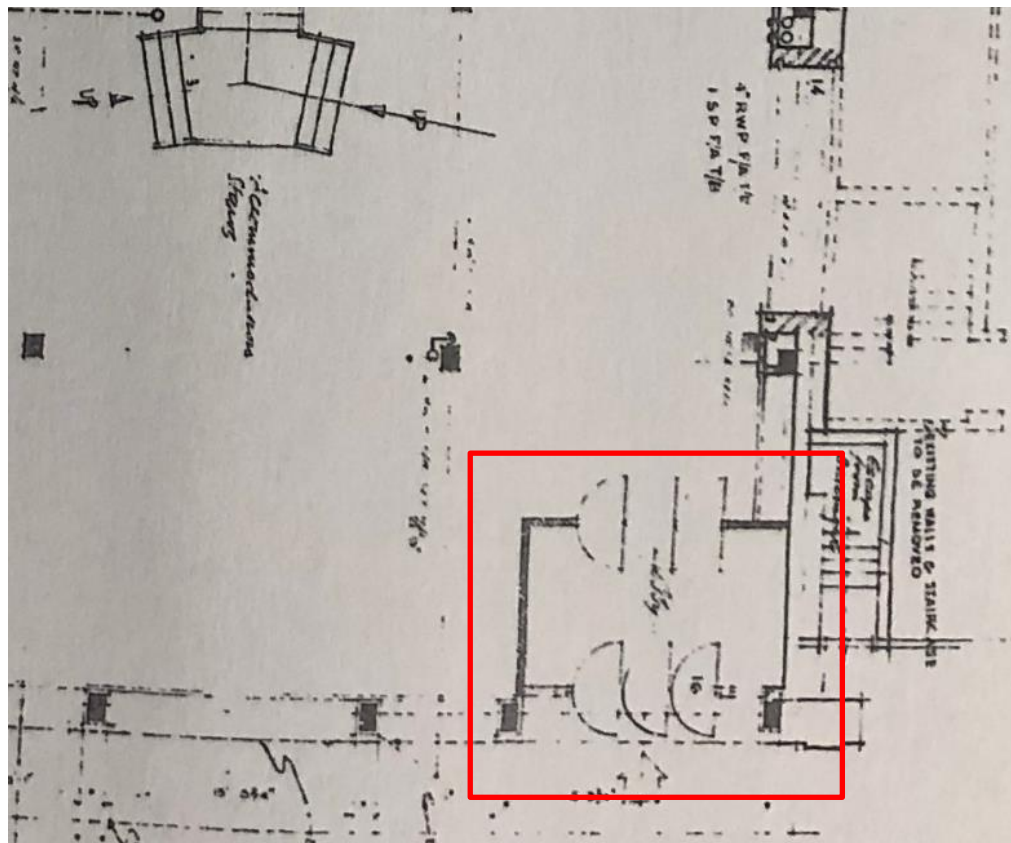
Extract of 1963 Proposed Ground Floor Plan (building entrance outlined in red)
